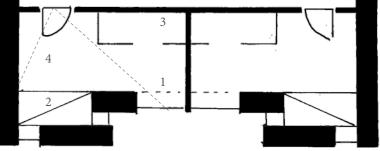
1/ immersion 2/ refuge 3/ bath 4/ floor
